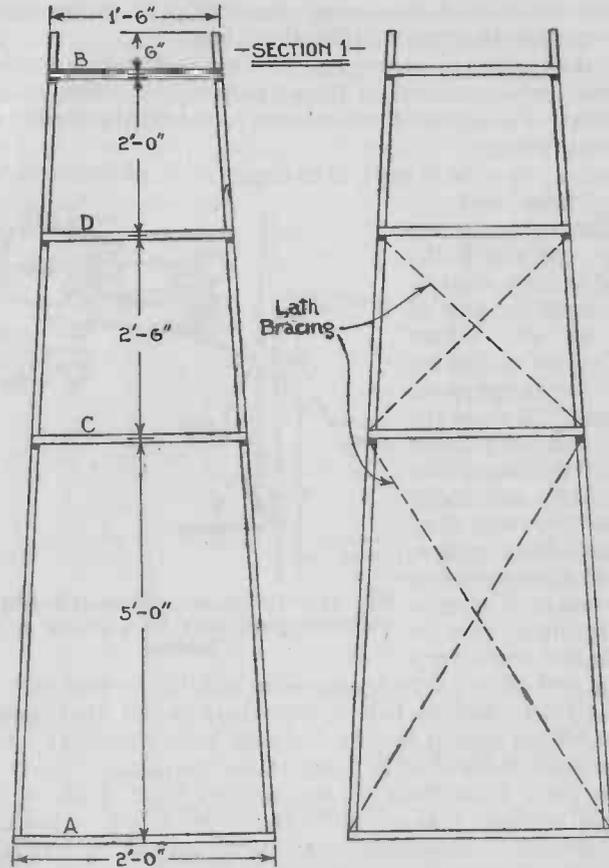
Method of building the first section and fixing cross-bracing strips.
